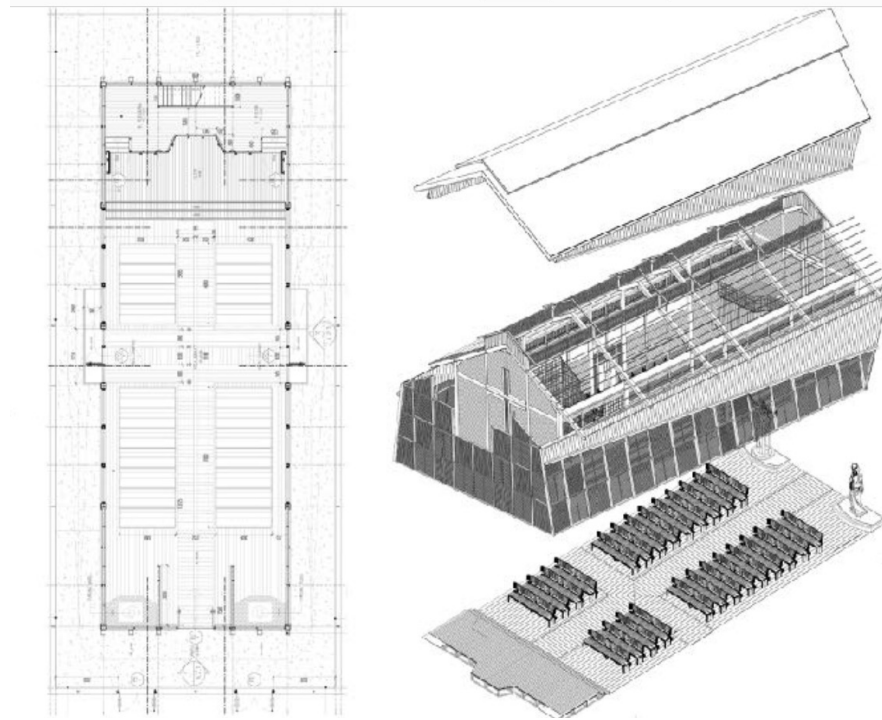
Design and construction of Oikumene Church, Sajau Project.
